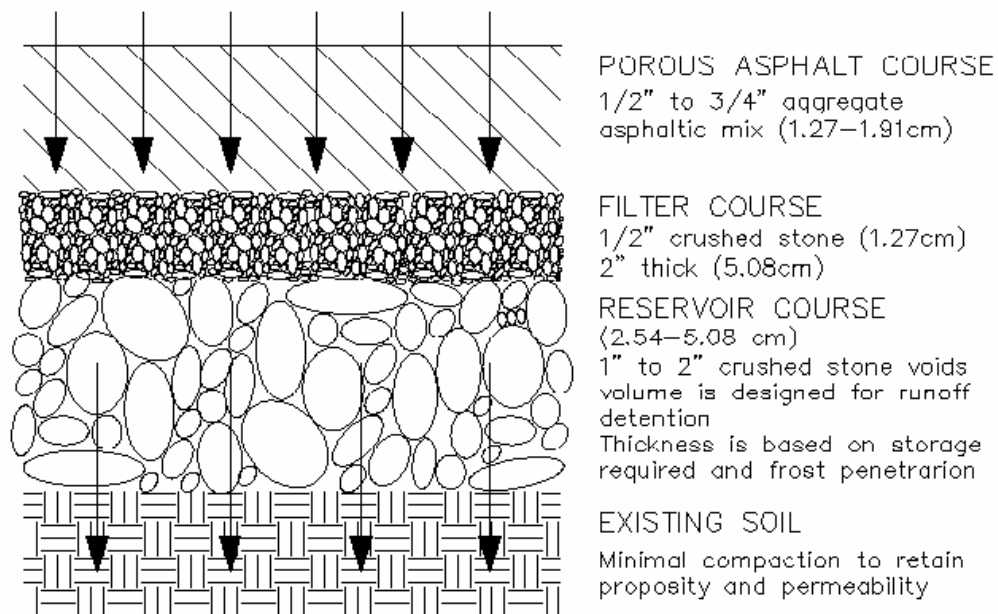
TYPICAL SECTION THROUGH ASPHALT POROUS PAVEMENT
